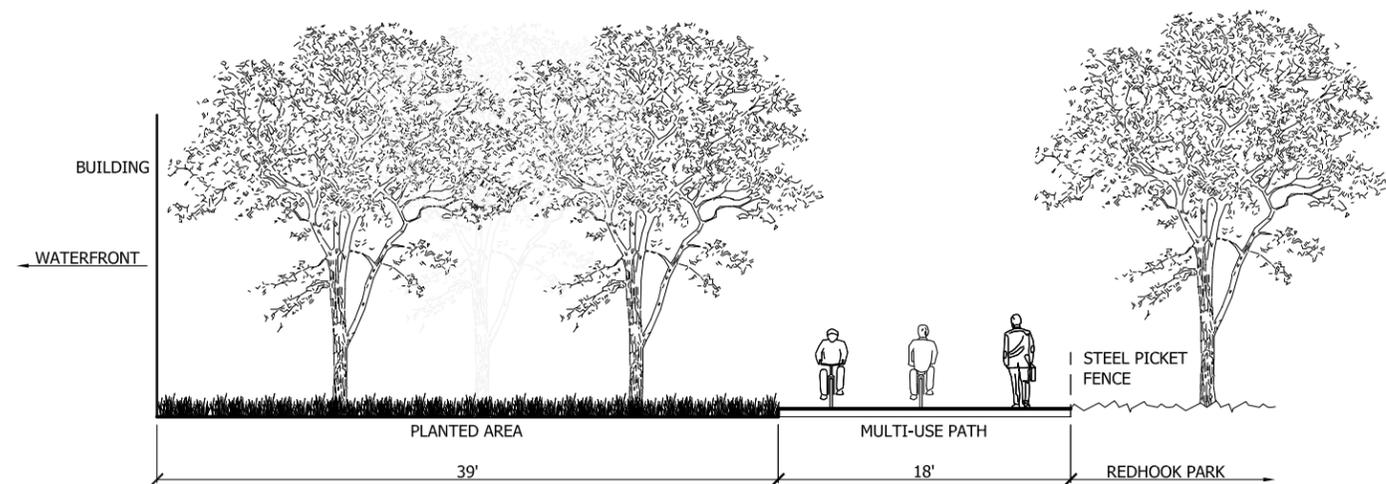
Possible configuration for Halleck Street between Court Street and Clinton Street
